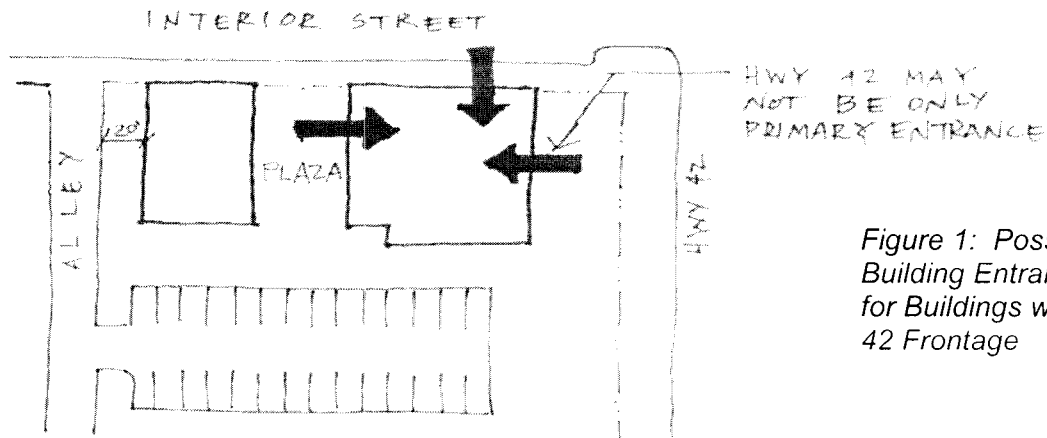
Possible Primary Building Entrance Locations for Buildings with Highway 42 Frontage
